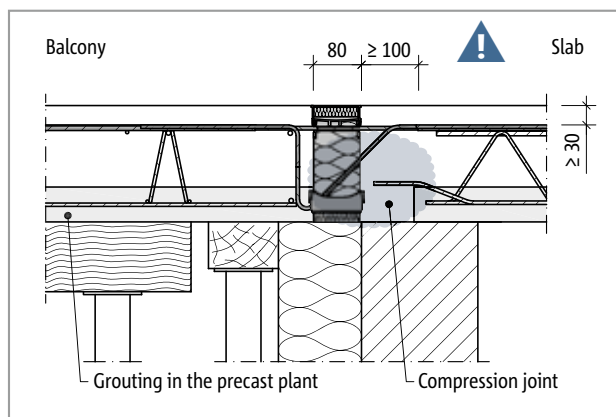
Schöck Isokorb® T type K/KF: Direct support, installation in conjunction with prefabricated slabs (here: $h \leq 170$ mm), compression joint on the floor side
